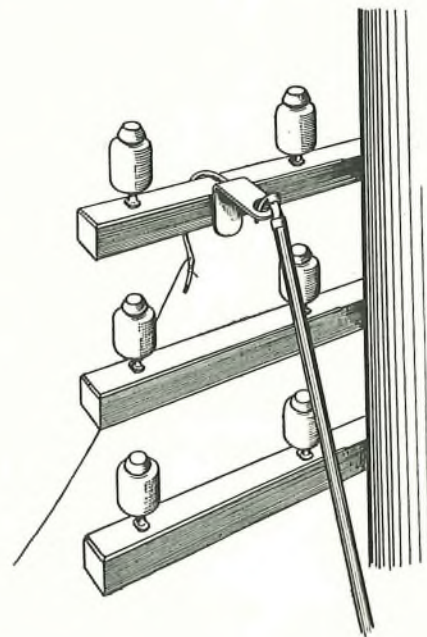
TOOL AND LINE WIRE BEING DRAWN OVER THE ARM.
